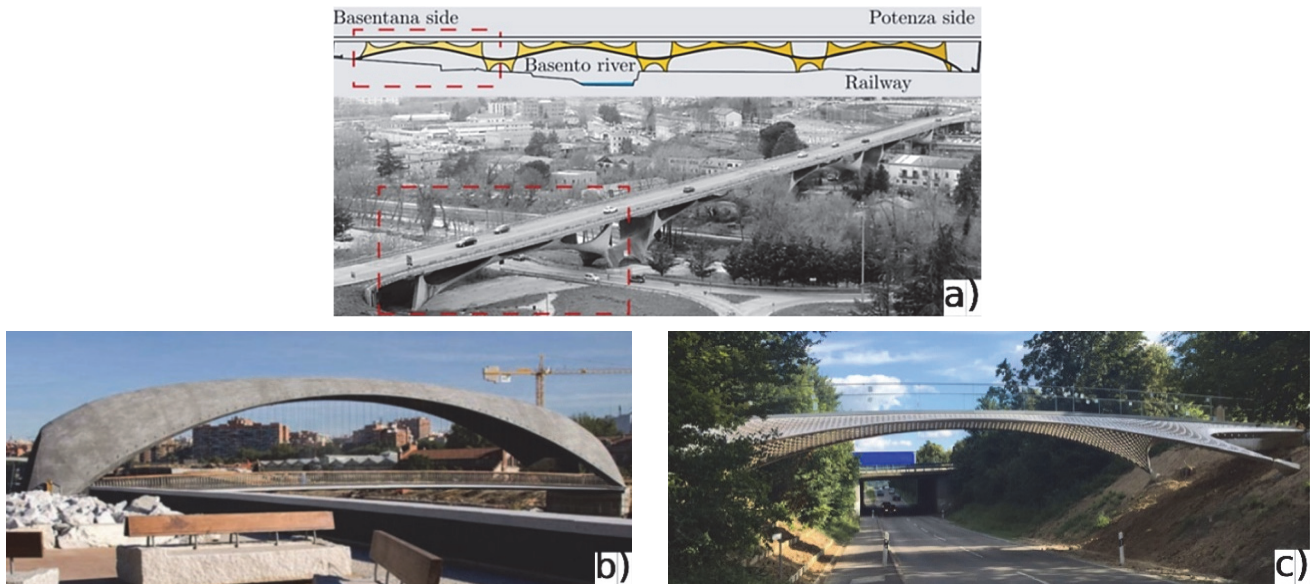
Musmeci’s bridge, Potenza, Italy (a); Matadero footbridge, Madrid, Spain (b); TRUMPF footbridge, Ditzingen, Germany (c)
